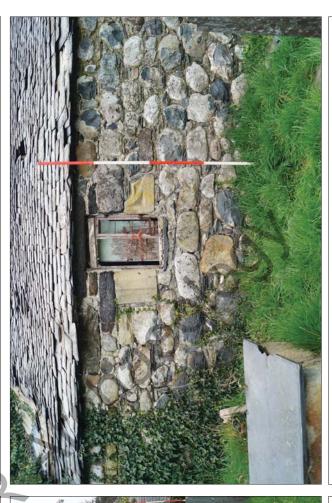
Stonework from Church Incorporated into Farm Outbuilding
